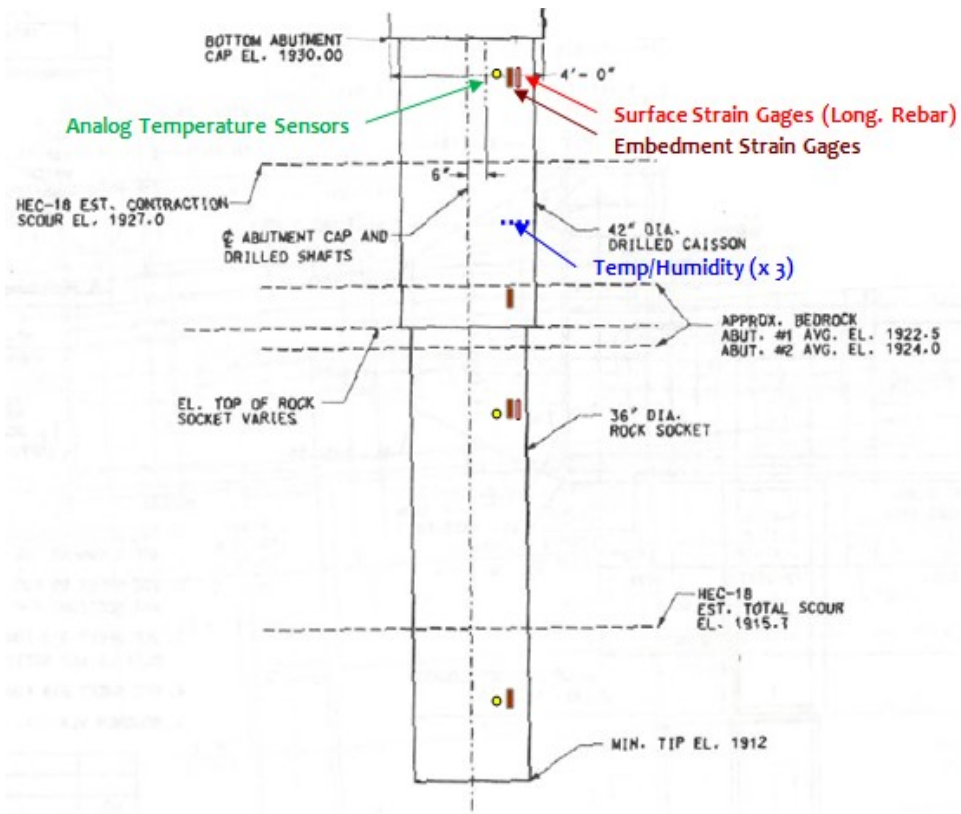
Gage locations for heavily-instrumented caissons. Elevation view.
